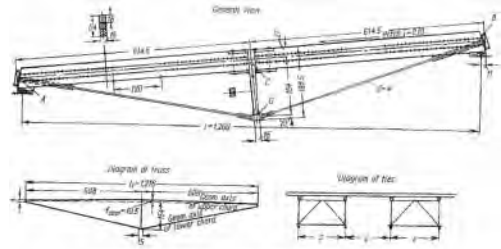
Single-pitch (low rise) truss design with a span of 11 m.
